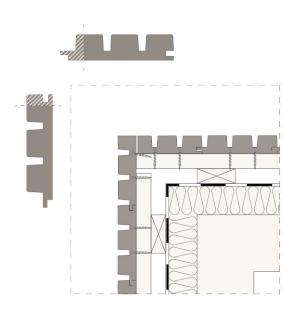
External corner finishing by cutting off both the tongue and groove edges of the two connecting boards
